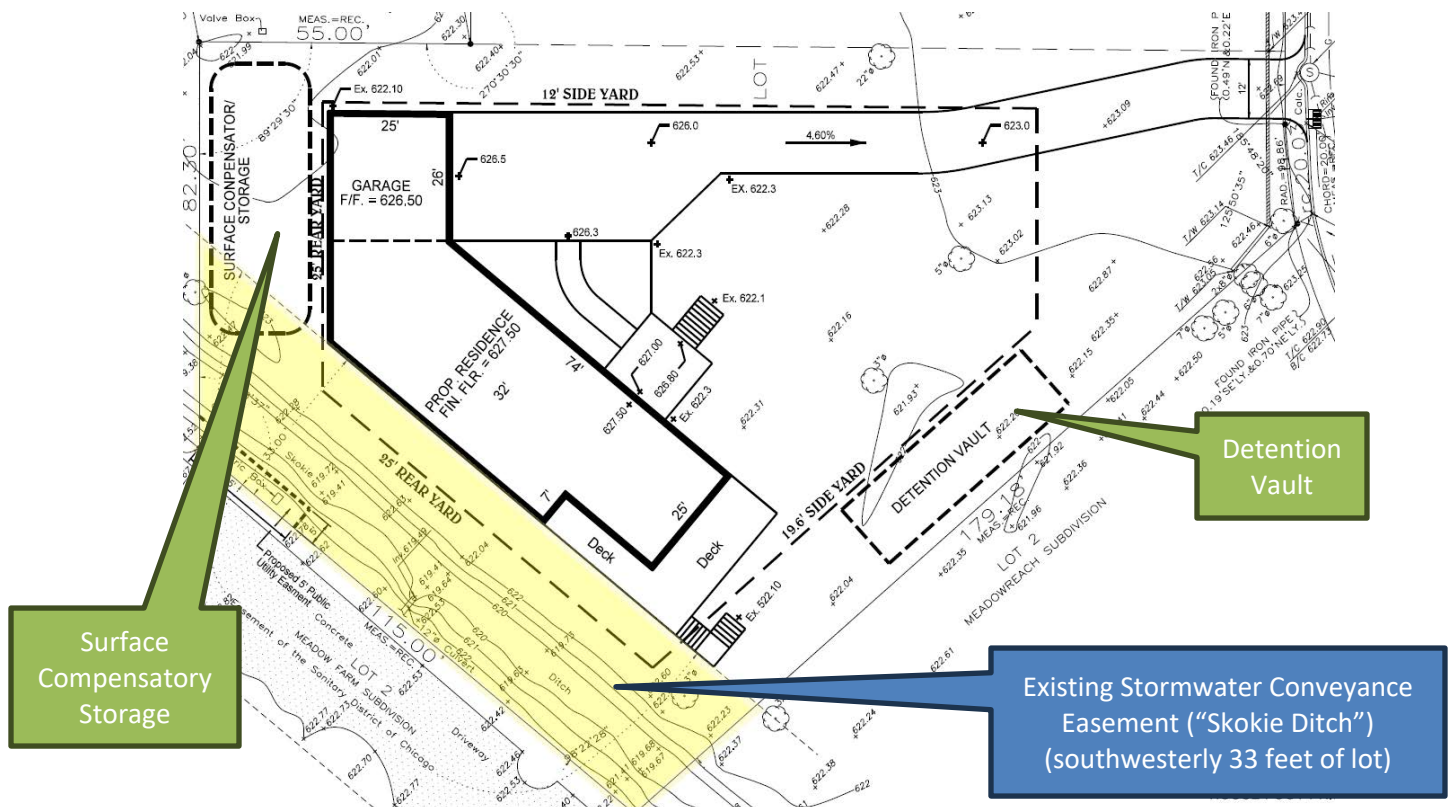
Engineering Exhibit Provided by Applicant for Proposed Lot 2 (South Lot)
